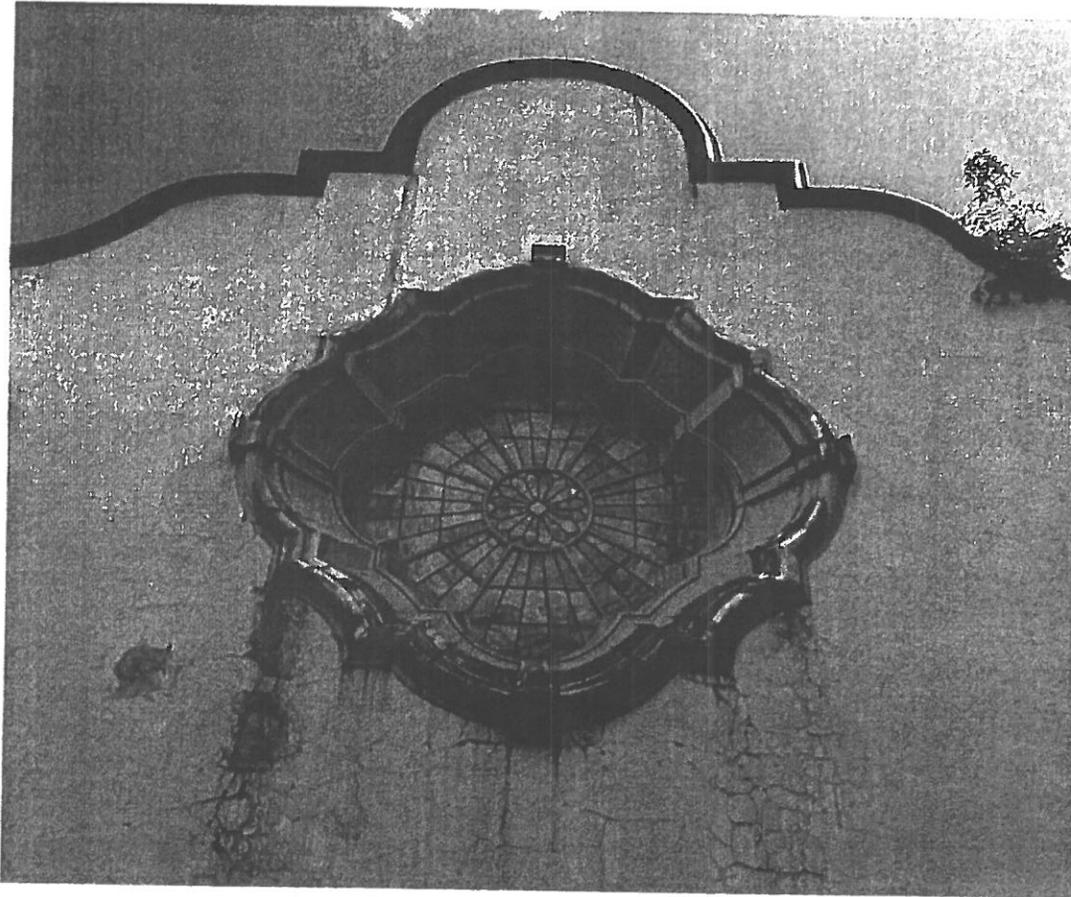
Assembly Hall with central axis stained glass window with cast ornamentation details. Health, Gove & Bell Architects, 1916. Photograph 2015.
